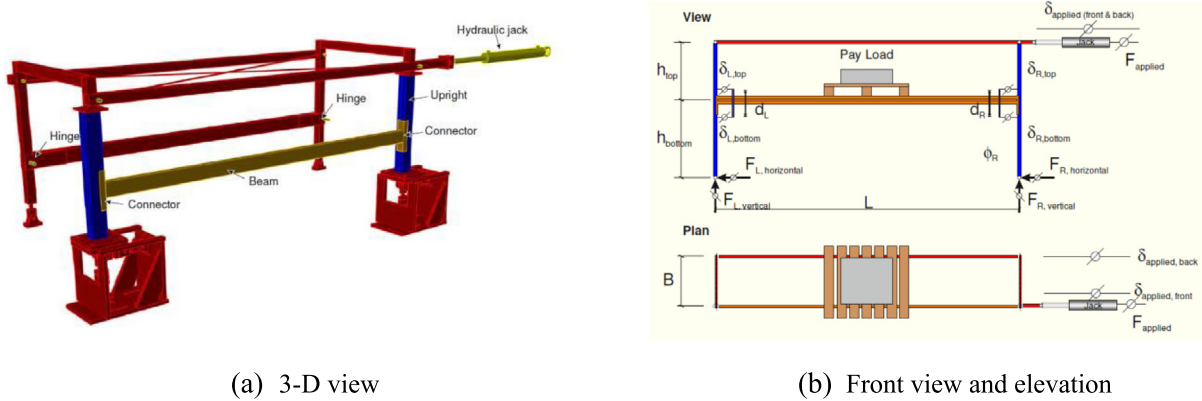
Subassembly testing setup in cross-aisle direction [3].
